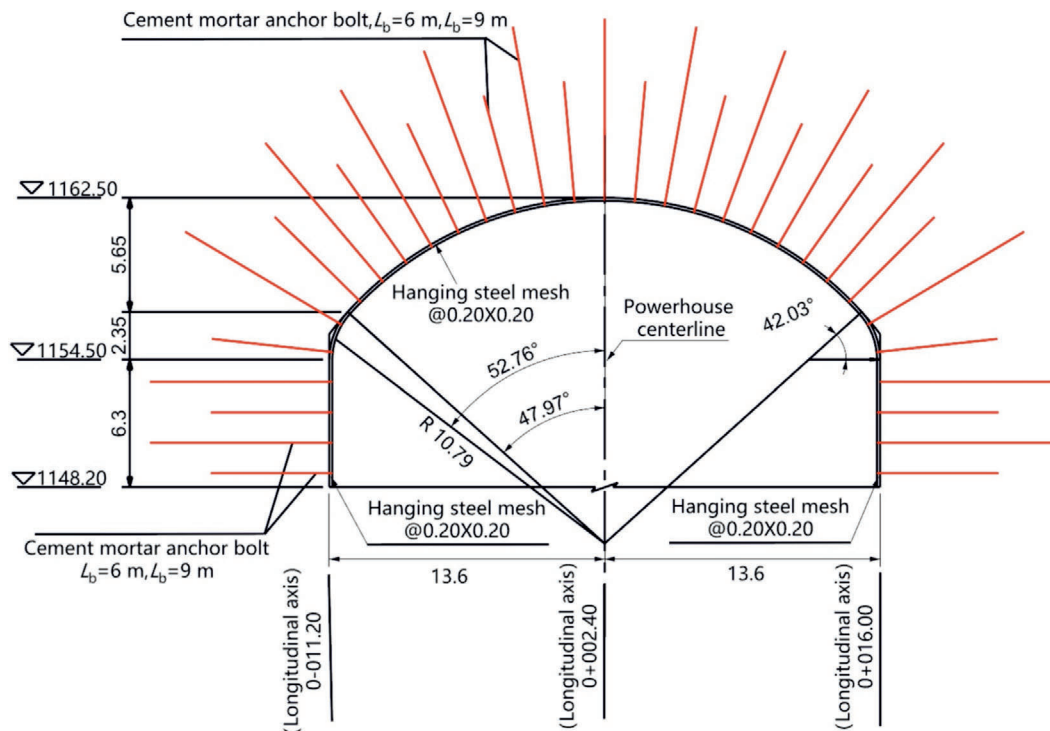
Top anchor bolt support diagram of the YLB hydropower station main powerhouse. (Unit: m)
